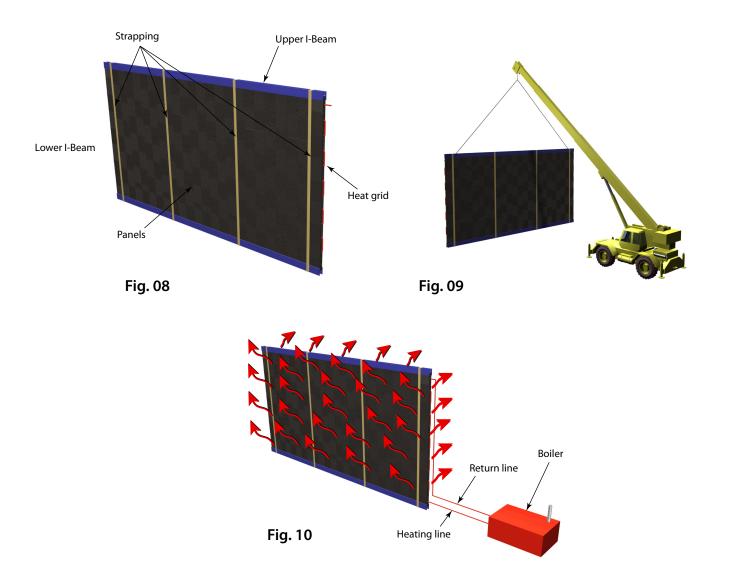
Shows a completed panel section with the addition of strapping to keep the I-Beams securely in place. Figure 09 Shows the ease of handling for the completed heating units. Figure 10 shows the general way a single panel unit could be connected to a boiler.
